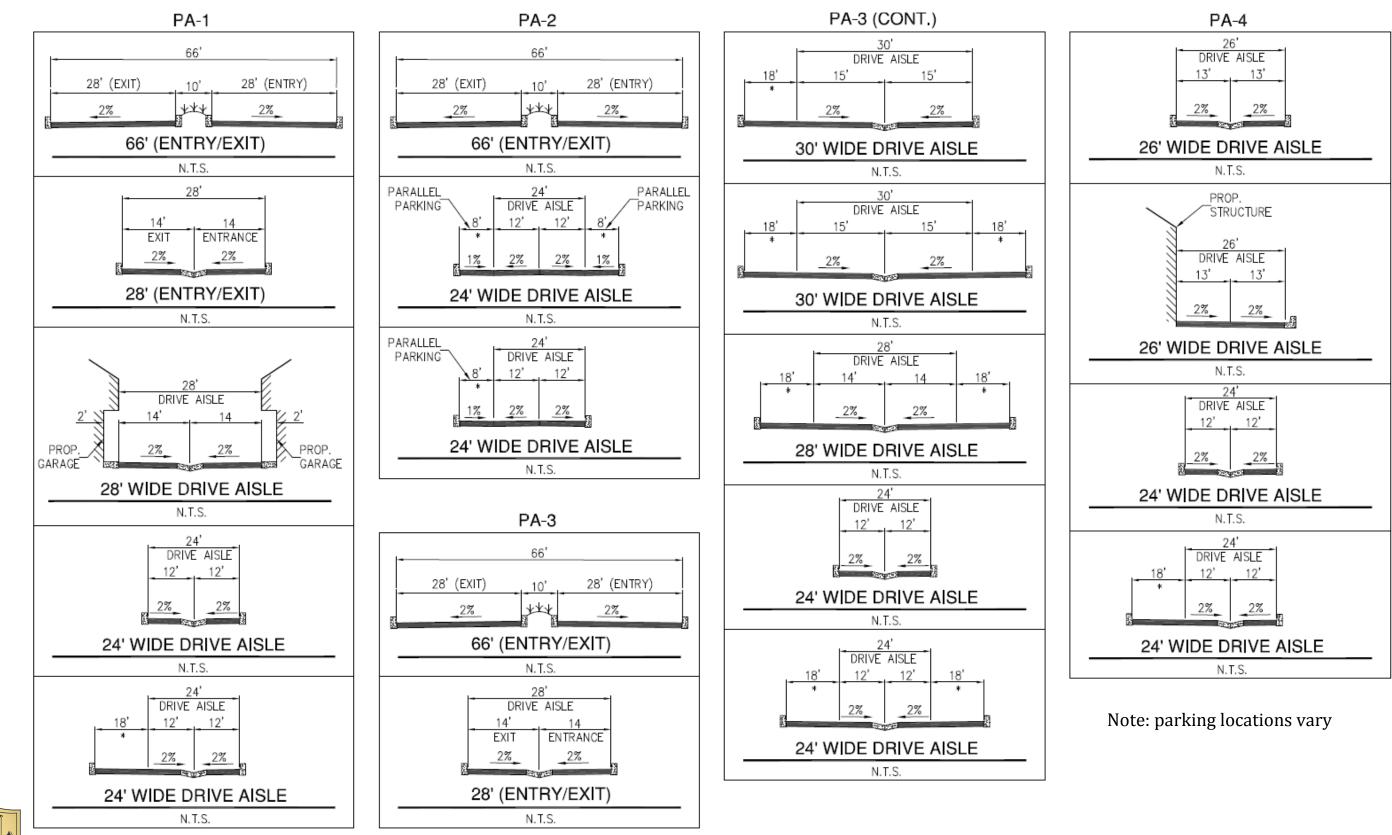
VEHICULAR CIRCULATION PLAN
